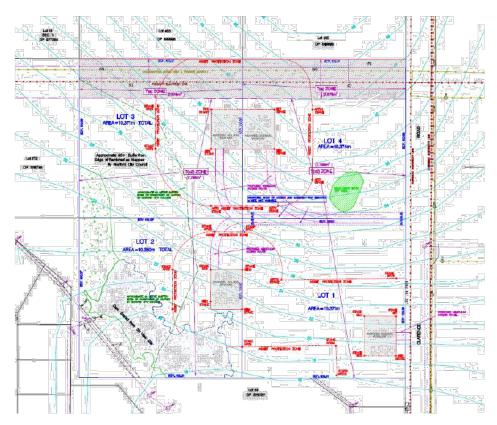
Plan of Subdivision (source: Hammond Smealie & Co Pty Ltd, Issue E, Dated 21/09/2020)
